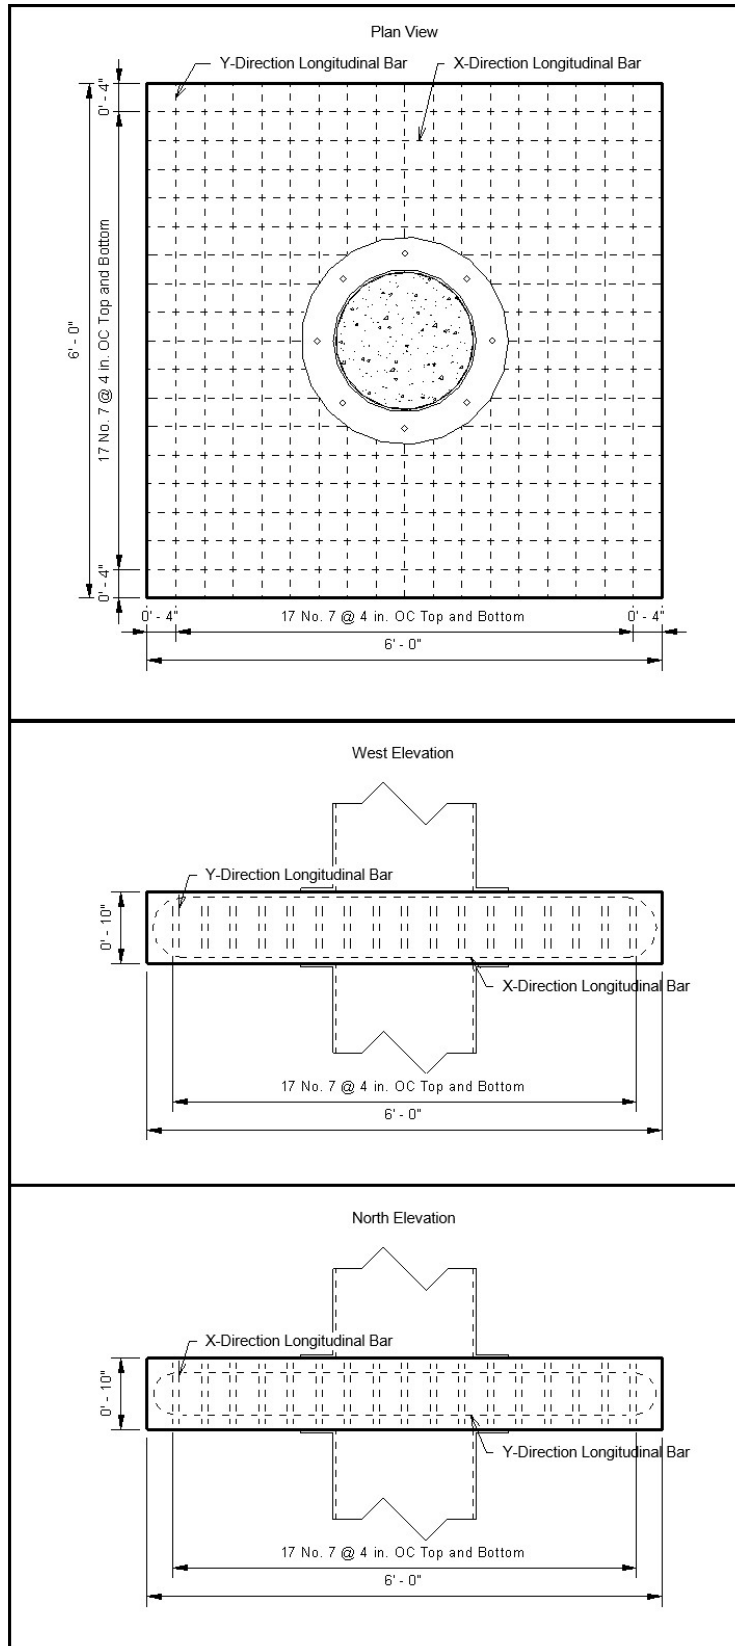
Slab Longitudinal Reinforcement Layout for Punching Specimens
